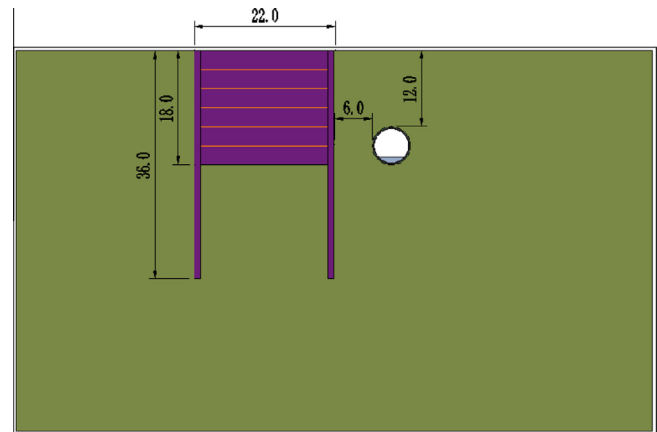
Geometry and location of the foundation pit and the tunnel (m).
